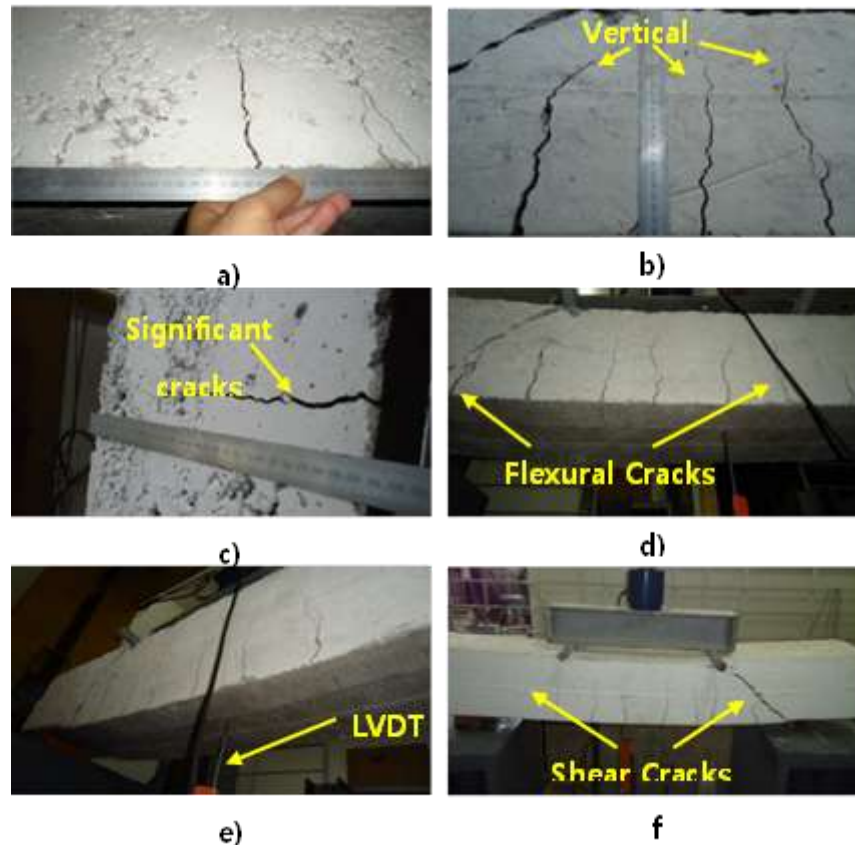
Crack and flexure behaviour of reference concrete beam.
